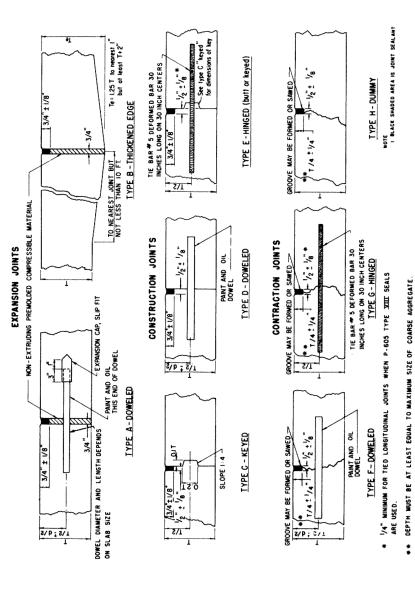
Details of joints in rigid pavement. (Source: Reference 8)
